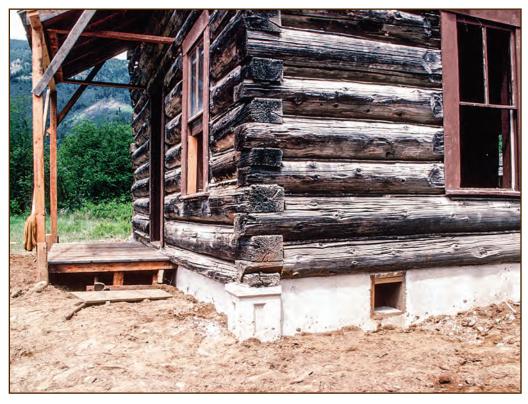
The completed replacement foundation matches the appearance of the original foundation, including the forming details on the corners. Preservation crewmembers created foundation vents out of the gaps in the foundation through which the steel beam needles extended.
